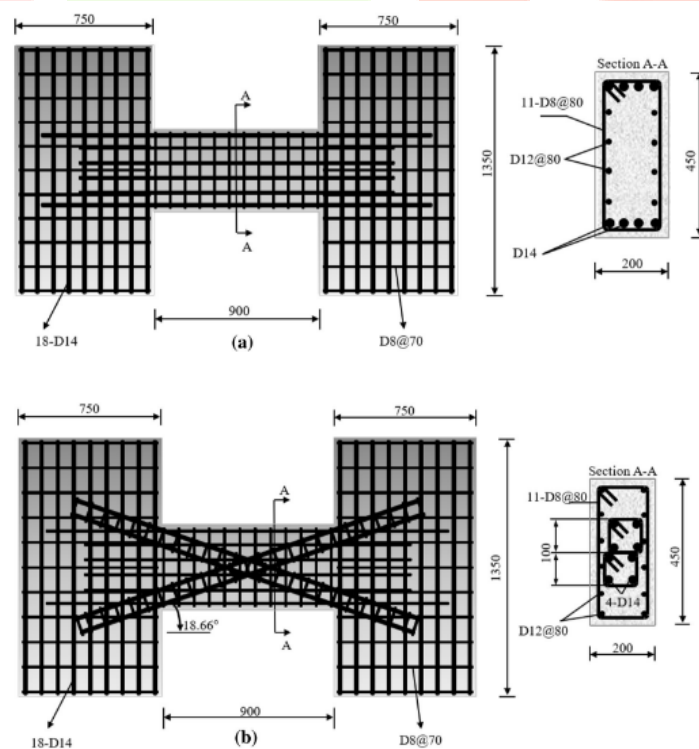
Dimensions and details of the Coupling Beam Specimens (a) CRCCB, (b) DRCCB
